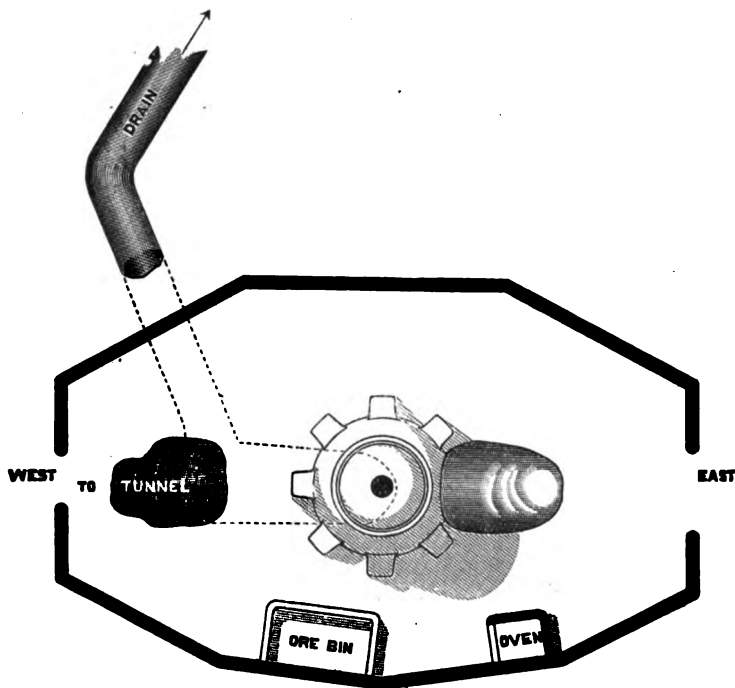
Plan showing Arrangement of Shed. (Scale, $\frac{1}{8}$ inch to 1 foot.)
